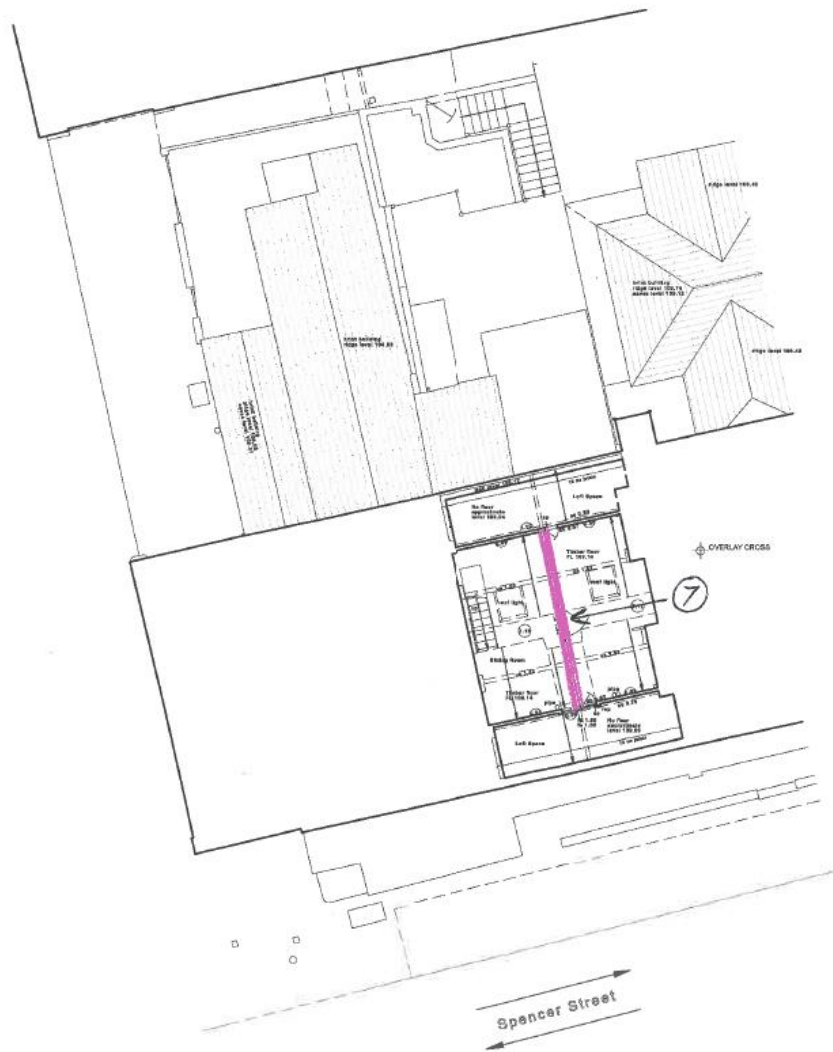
Loft Floor Plan, showing work item 7, as listed in the table in Section 7.1
